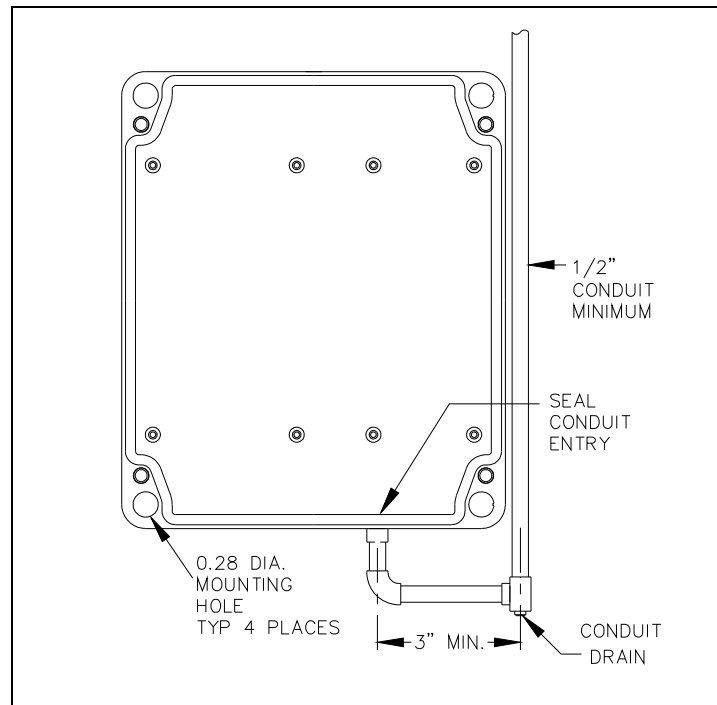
Bottom entry conduit installation details (RECOMMENDED for non-metallic enclosures)
